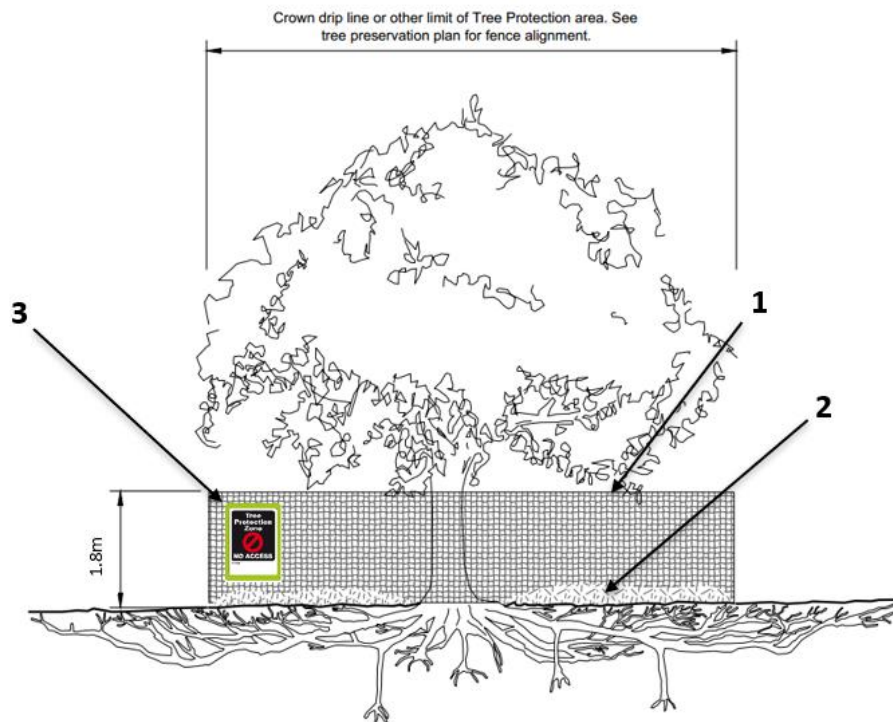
Tree protection zone detail. 1. Tree Protection Fencing- To consist of chain wire mesh panels with shade cloth (if required) held in place with concrete feet or plywood or wooden fence panels. Fence to be a minimum height of 1.8m and to be established to the extent of the TPZ as directed by the project arborist. AS4687 specifies applicable fencing requirements. 2. Mulching – If deemed applicable by the project arborist the area within the TPZ is to be mulched. Mulch is to comply with AS4454 and maintained to a depth of 100-150mm. 3. Signage – Signs identifying the TPZ should be placed around the edge of the TPZ and identifiable from within the development site. Lettering on the sign should comply with AS1319.
